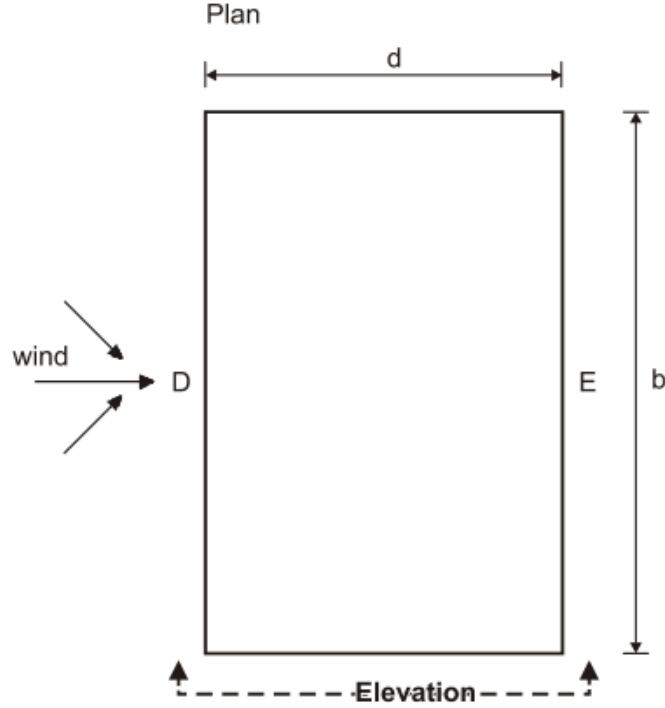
Building from above with wind-zones (source: [11], edited).
